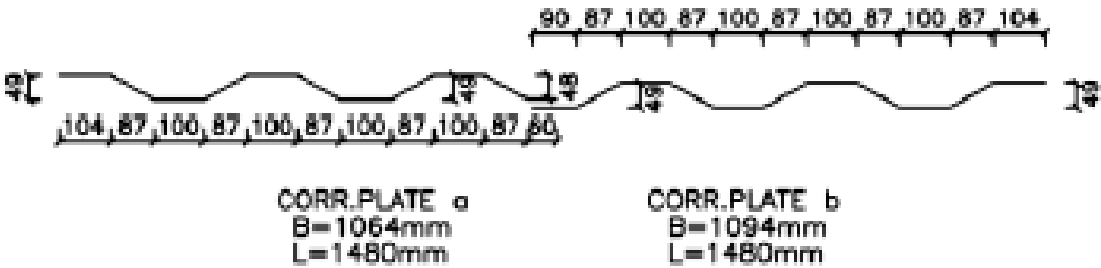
Details of the trapezoidal corrugated steel plate [14].
